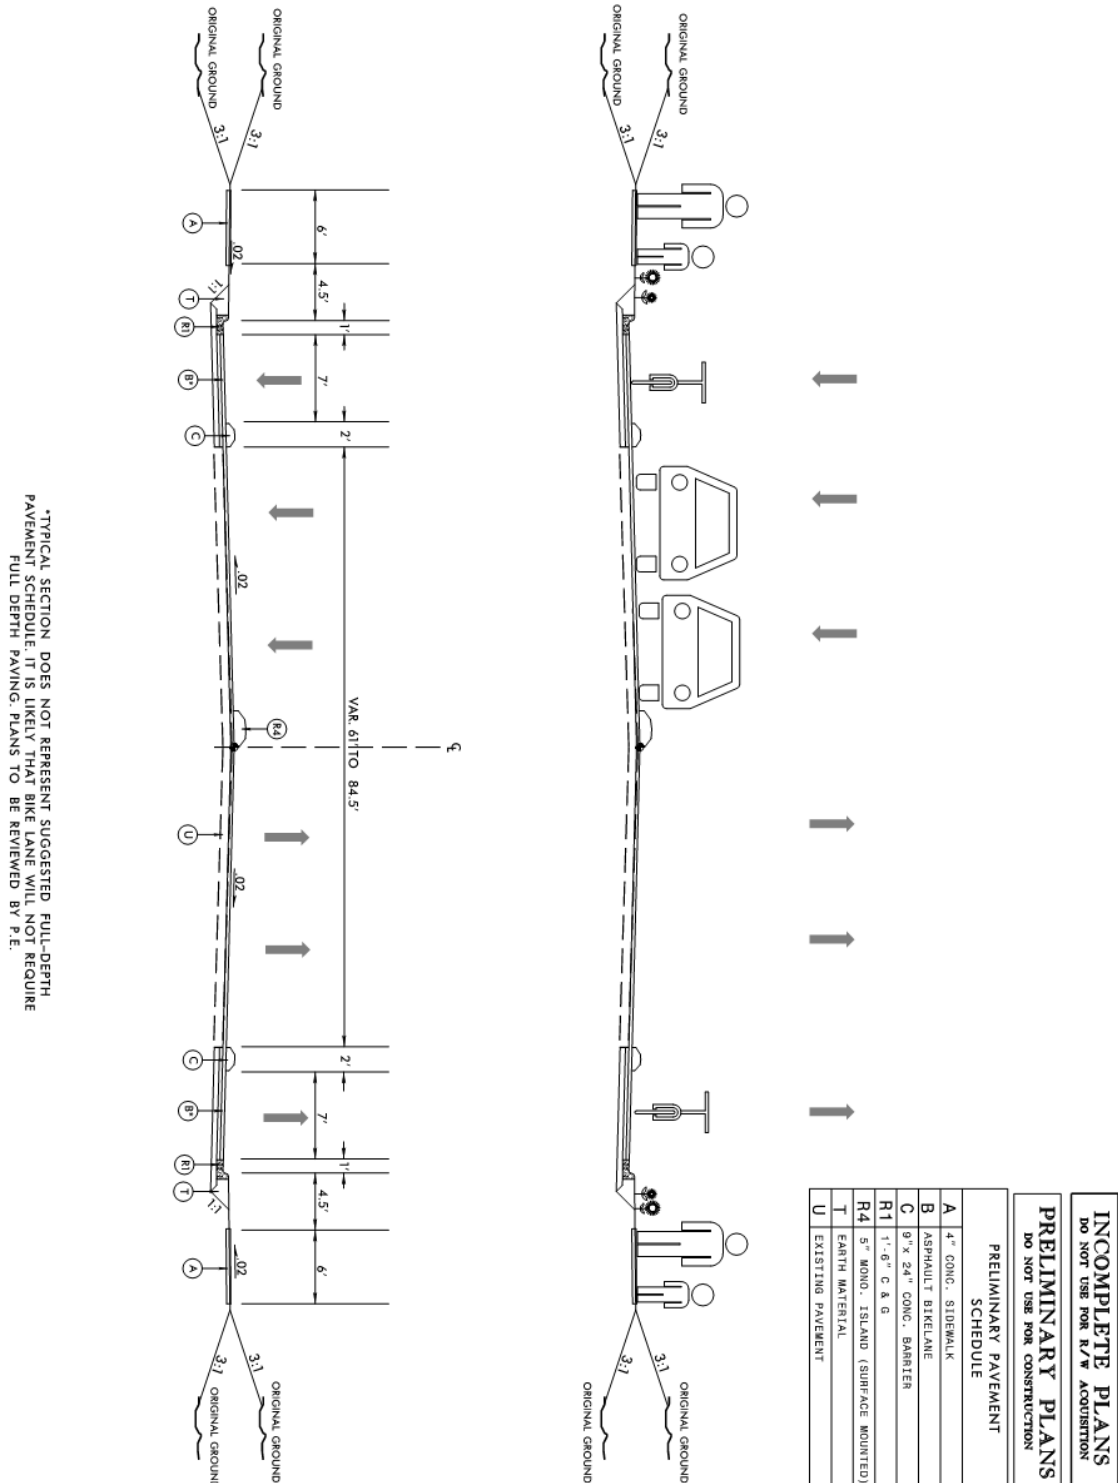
B Typical cross section of the proposed cycle tracks approaching the Protected Intersection
